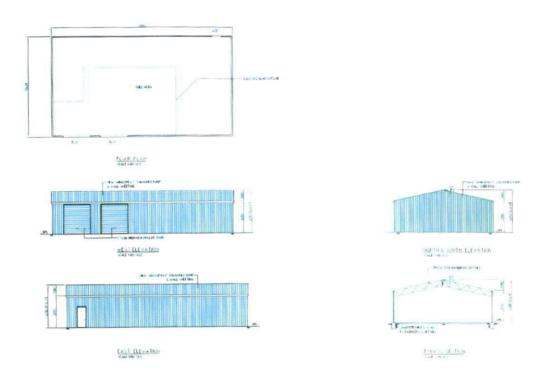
Proposed new agricultural shed plan, elevations and section.
